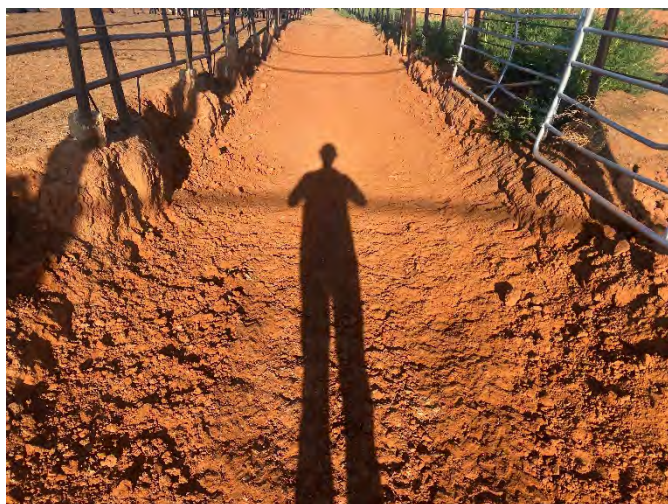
Photo view of release area after further excavation of impacted soils (30Aug23)
